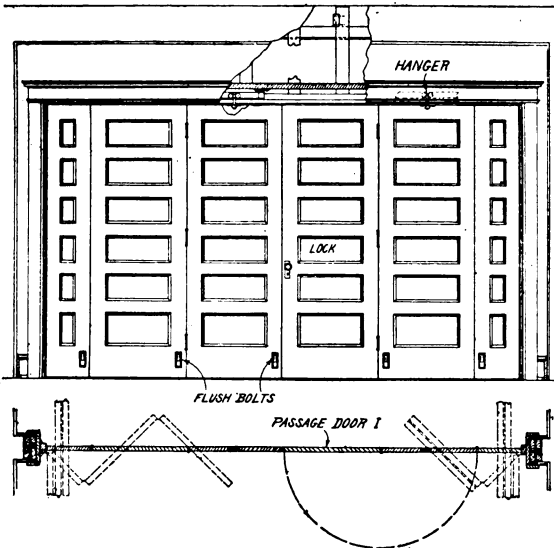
PLAN AND ELEVATION OF PARTITION HAVING FOUR FULL-SIZE DOORS AND TWO HALF DOORS
